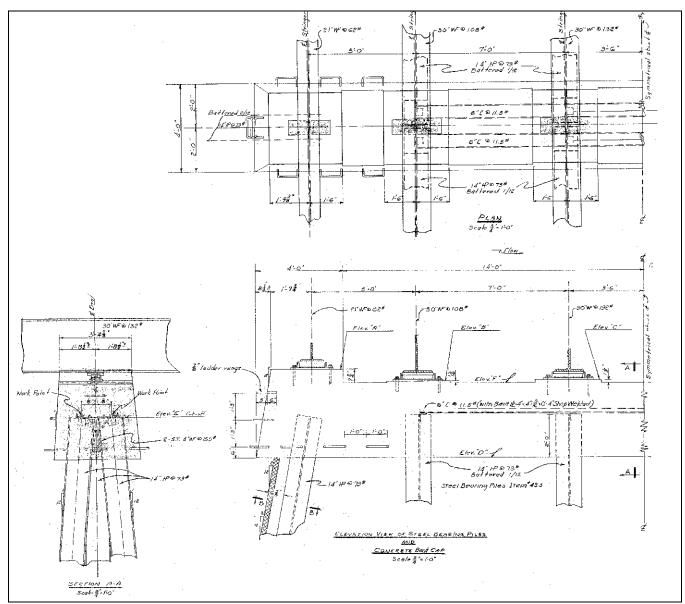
Plan, elevations and section of H-pile bent from original drawings (NHDOT File No. 3-4-3-5).
